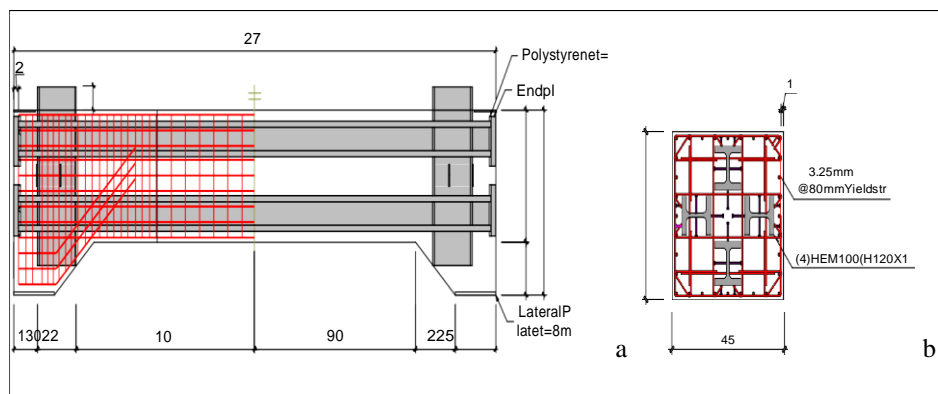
Details of the static tests: a) steel layout - longitudinal view; b) Cross section details
